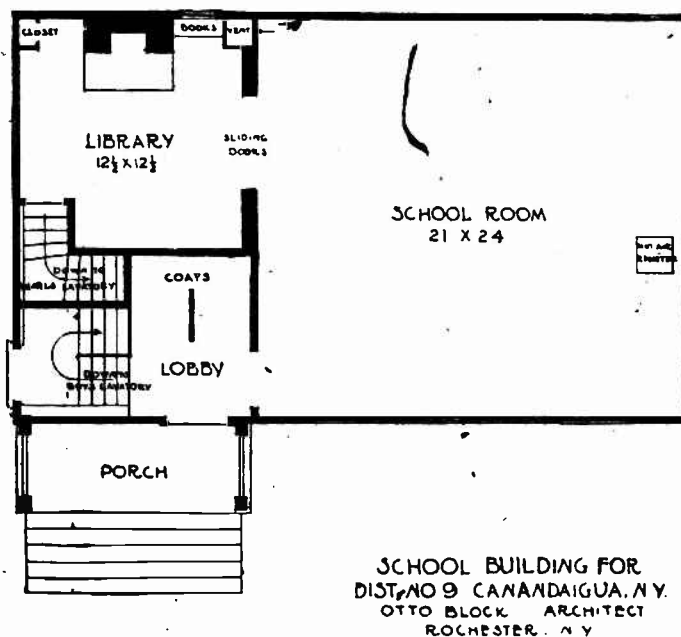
Floor plan of No. 9, Canandaigua, N. Y.
